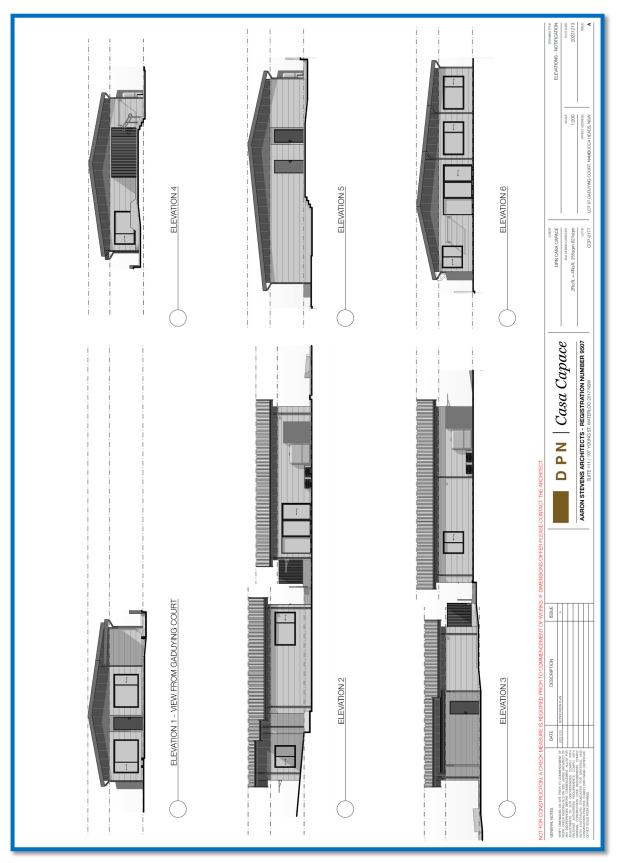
elevations (Aaron Stevens Architects, 13/12/2022)
